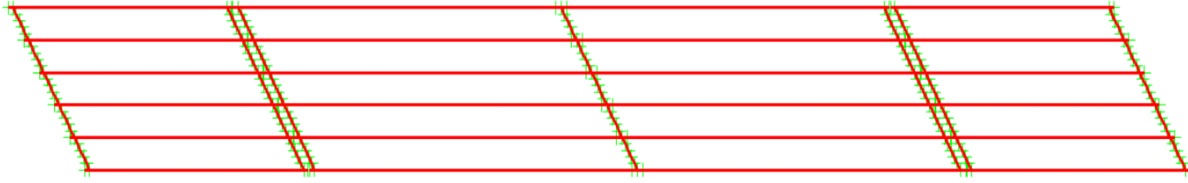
Plan view of the girders and diaphragms of the bridge model where all girders are made of concrete
